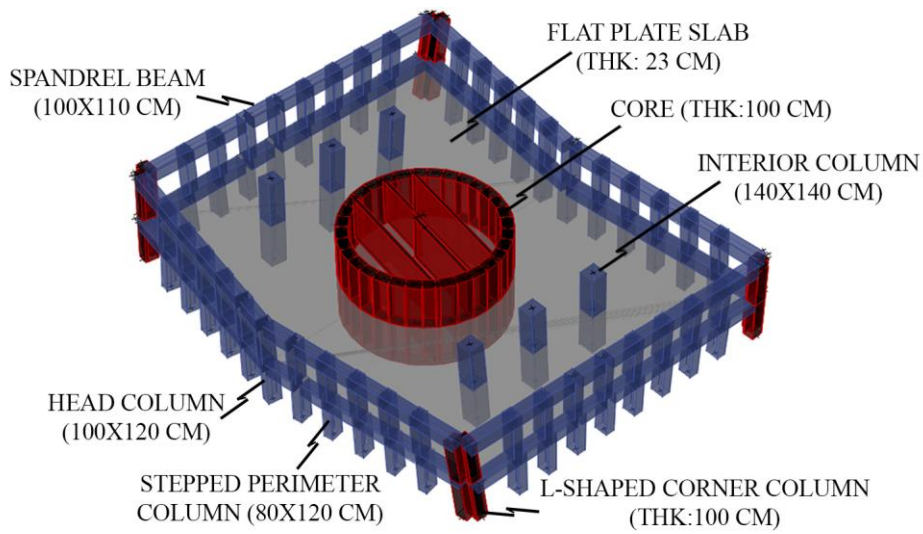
Typical floor structural system of twisting model (constructed in accordance with Baker et. al., 2010 and Efstathiou & Baker, 2014)
